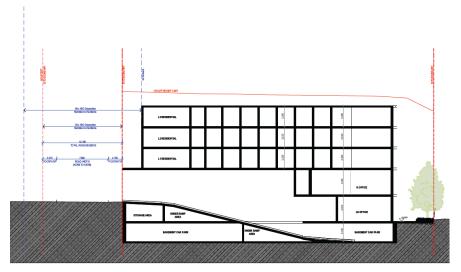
East-West Section through building and vehicular ramp housing 0m setback to employment sues and 3m setback to upper levels from Chester Street
